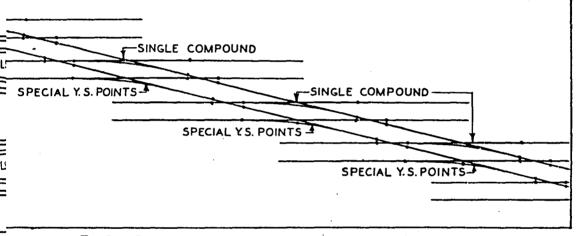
COMPOUND CROSSOVER USING SINGLE COMPOUNDS
